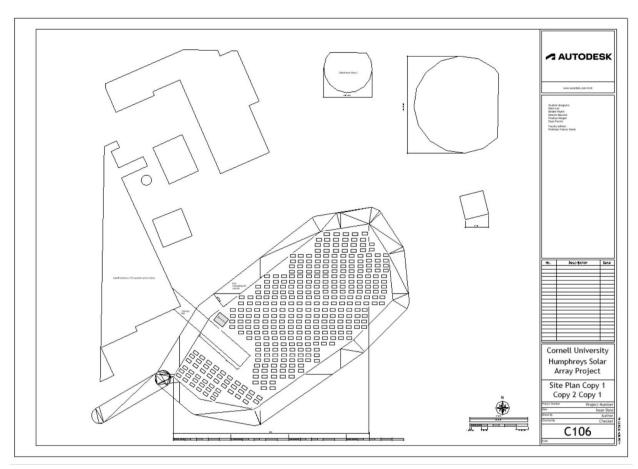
Revit of Potential Expansion plan of Solar Array Layout
